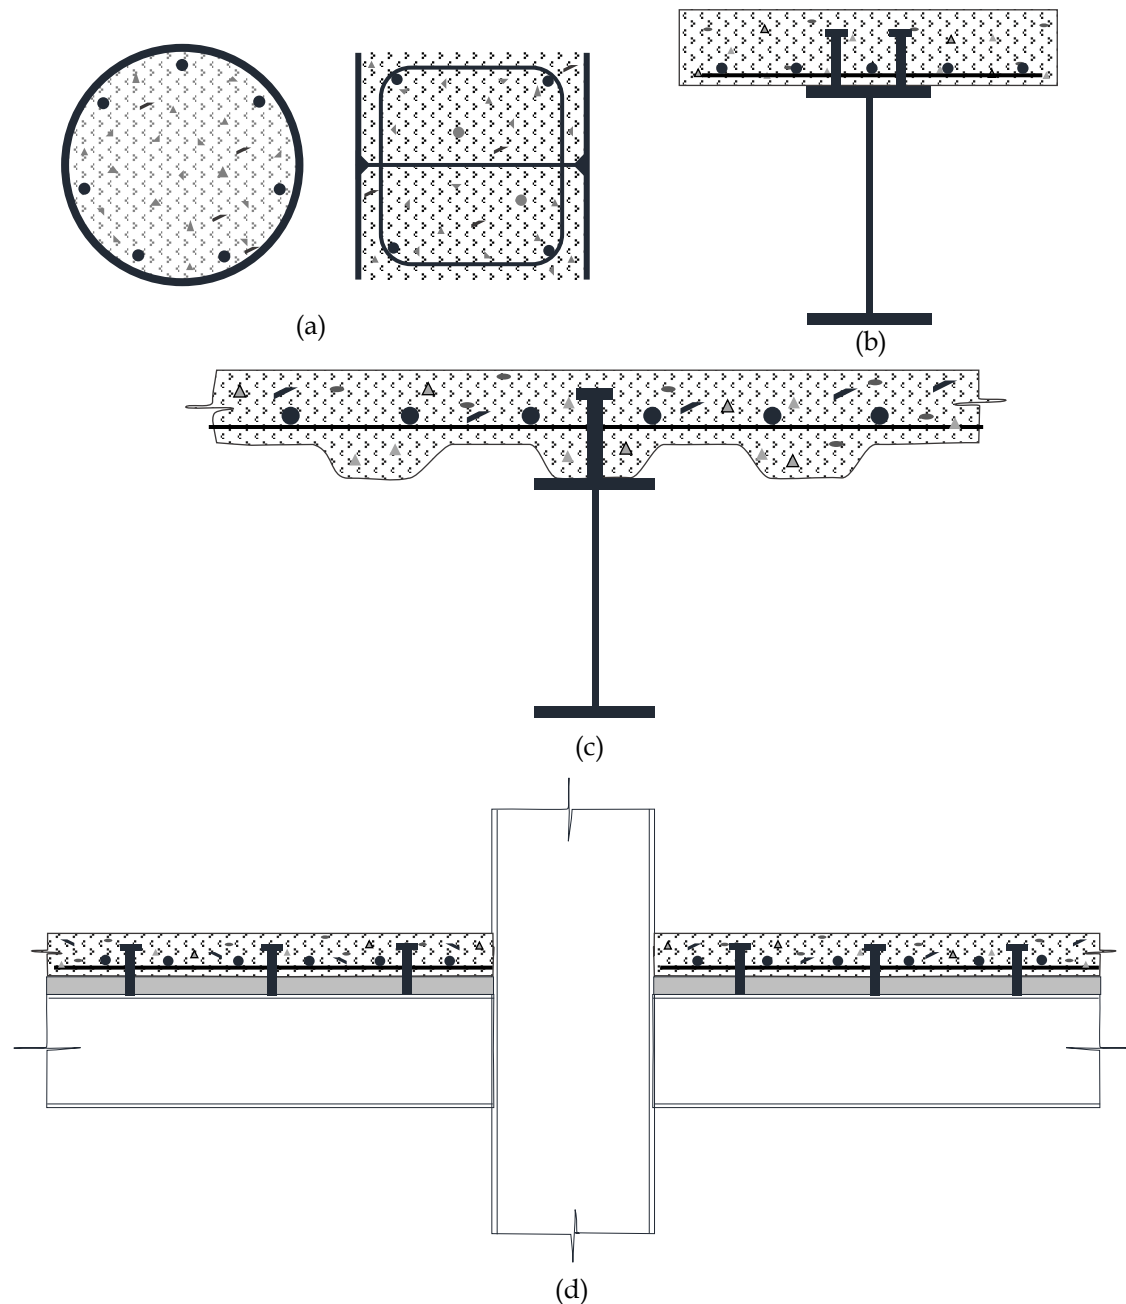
Different steel-concrete composite system; (a) concrete filled and concrete encased column section, (b) steel-concrete composite beam, (c) steel-concrete composite floor system and (d) composite column-beam connection
